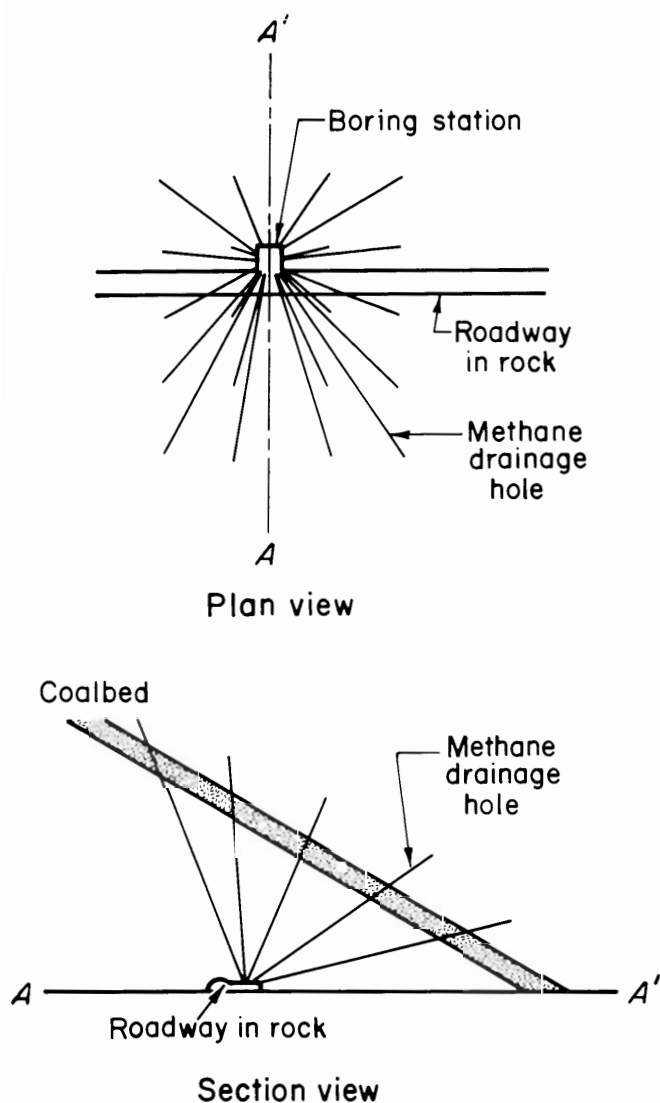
Schematic plan and section views of methane drainage boreholes drilled from roadway driven along strike in rock below mined coalbed, Japan (modified from Ohga and Higuchi (73)).
